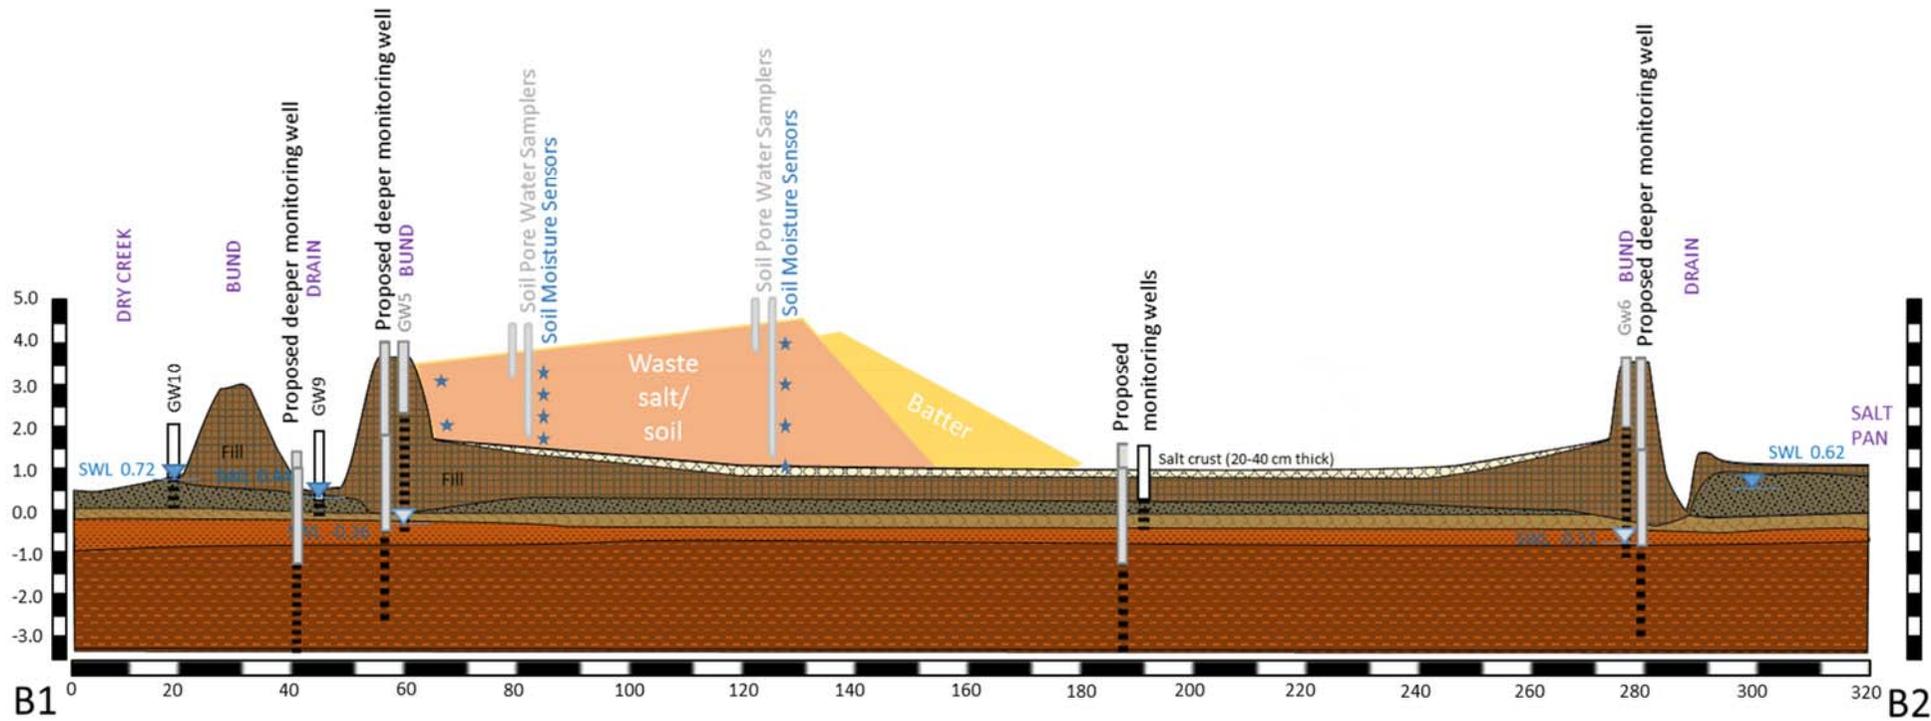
Cross-Sectional Concept Plan of G Row Pit and Instrument Installation
